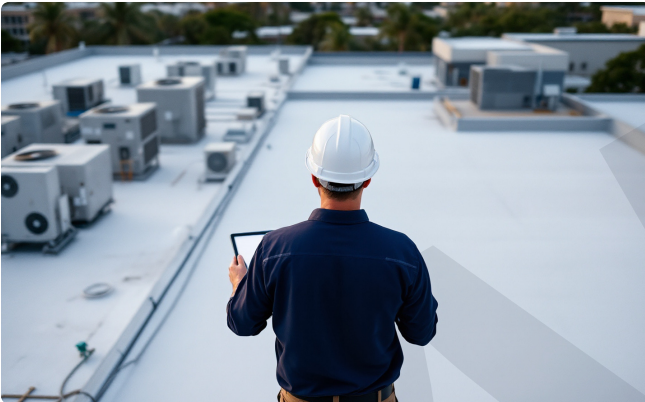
, ref R-1. General roof view, TPO membrane. Ponding staining visible along west drain line.
